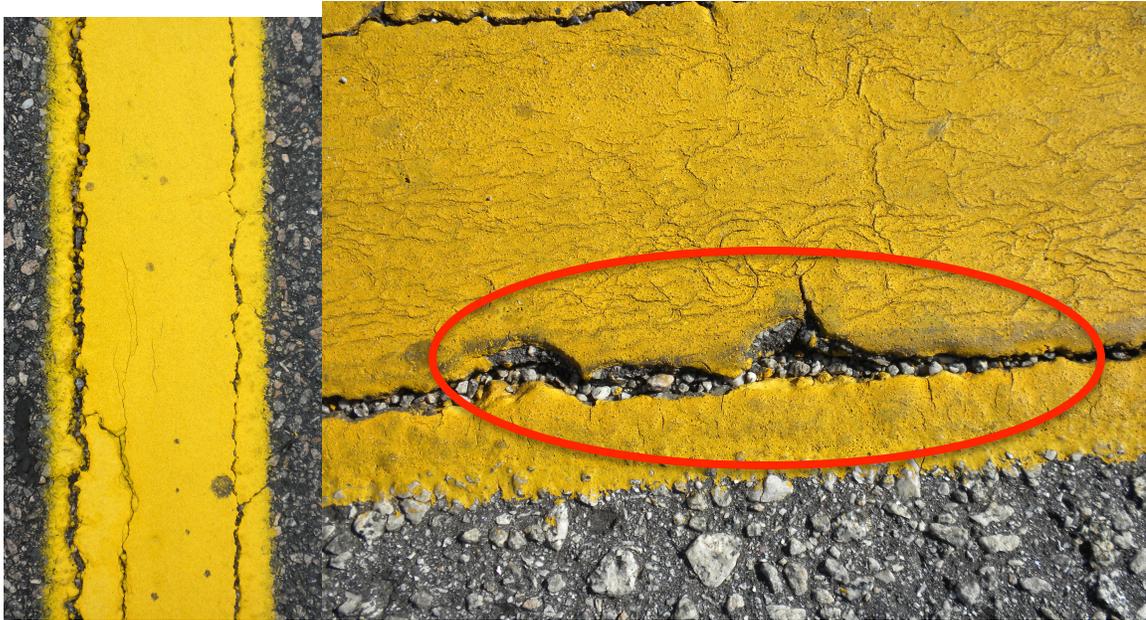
Pavement Damage Caused by Marking Materials
